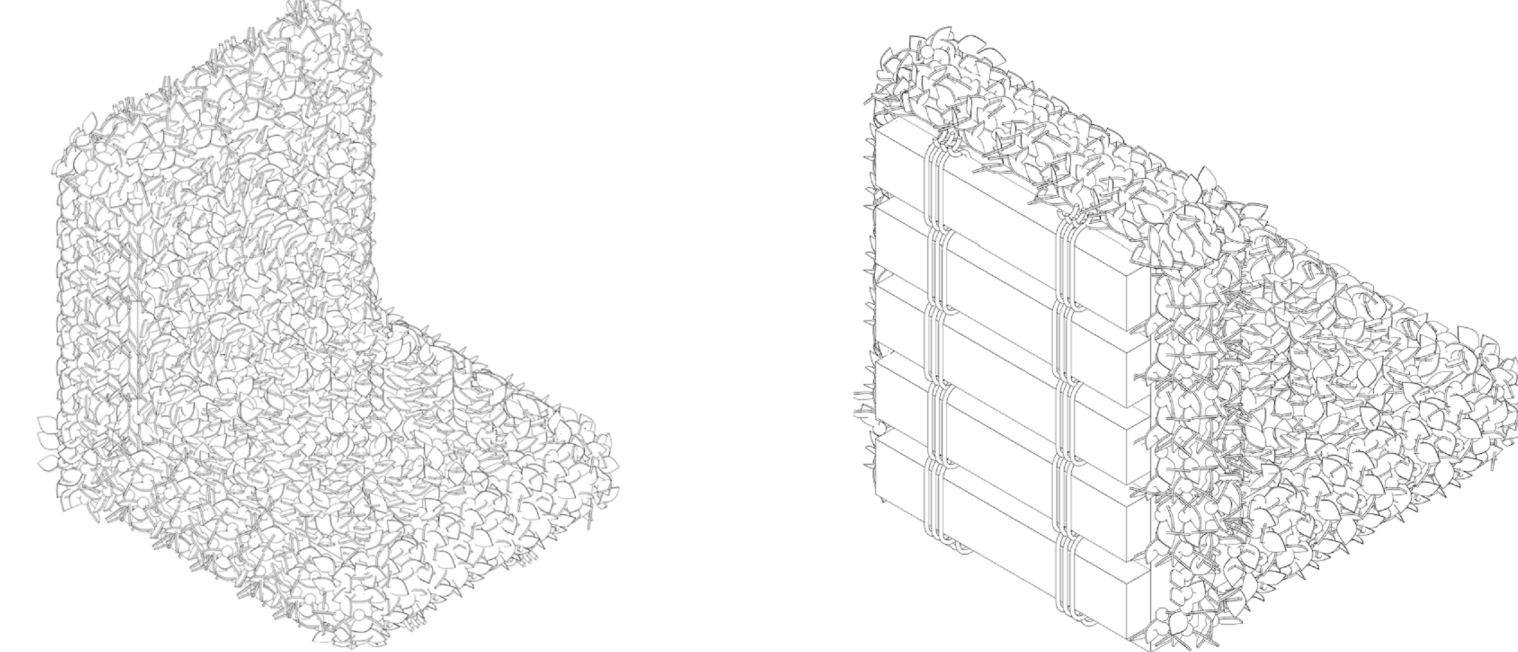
ELEVATION 2 ROLLED UP
